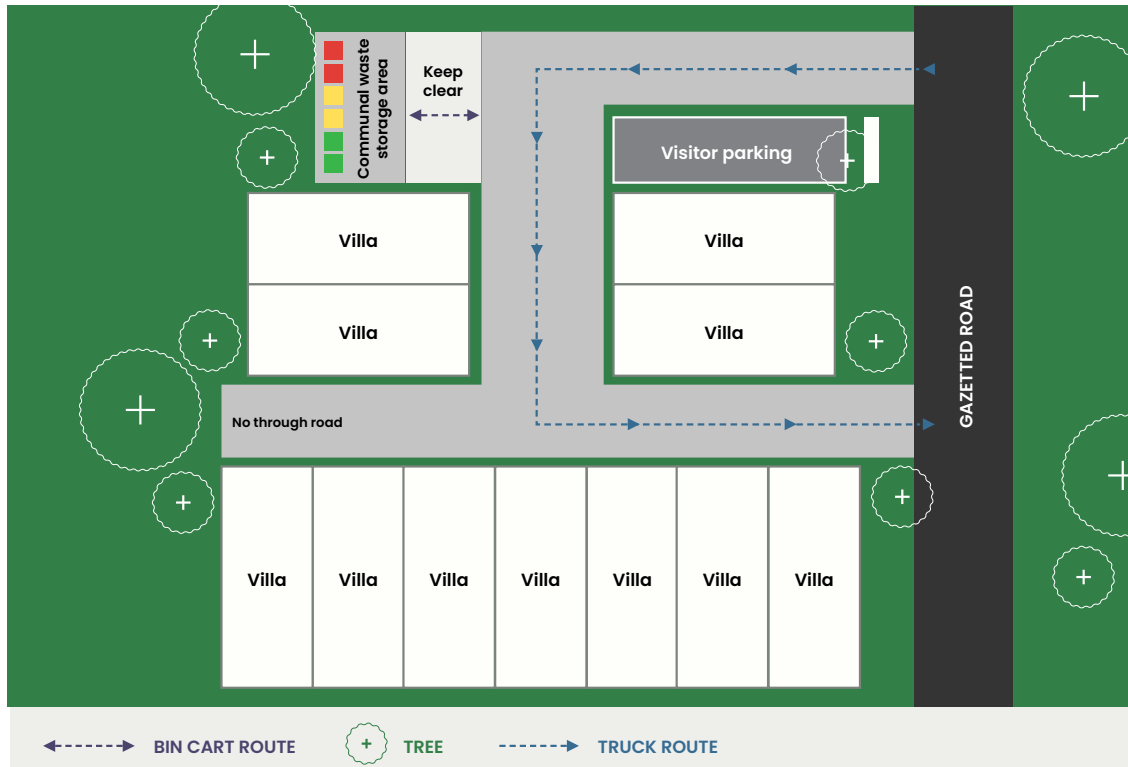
On-site waste collection point from a communal waste and recycling storage area.
